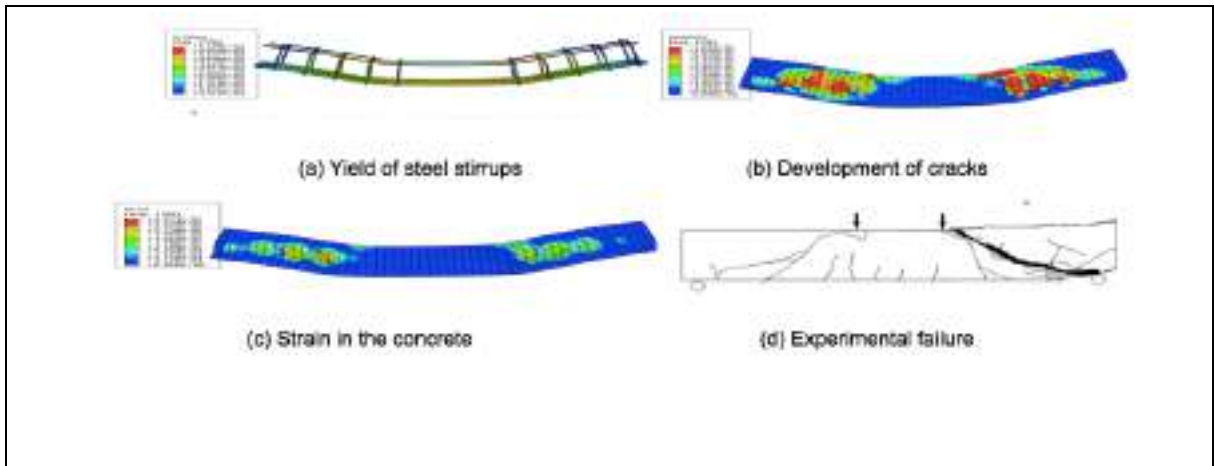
Mode of failure of control beam with steel stirrups (B12-S)
